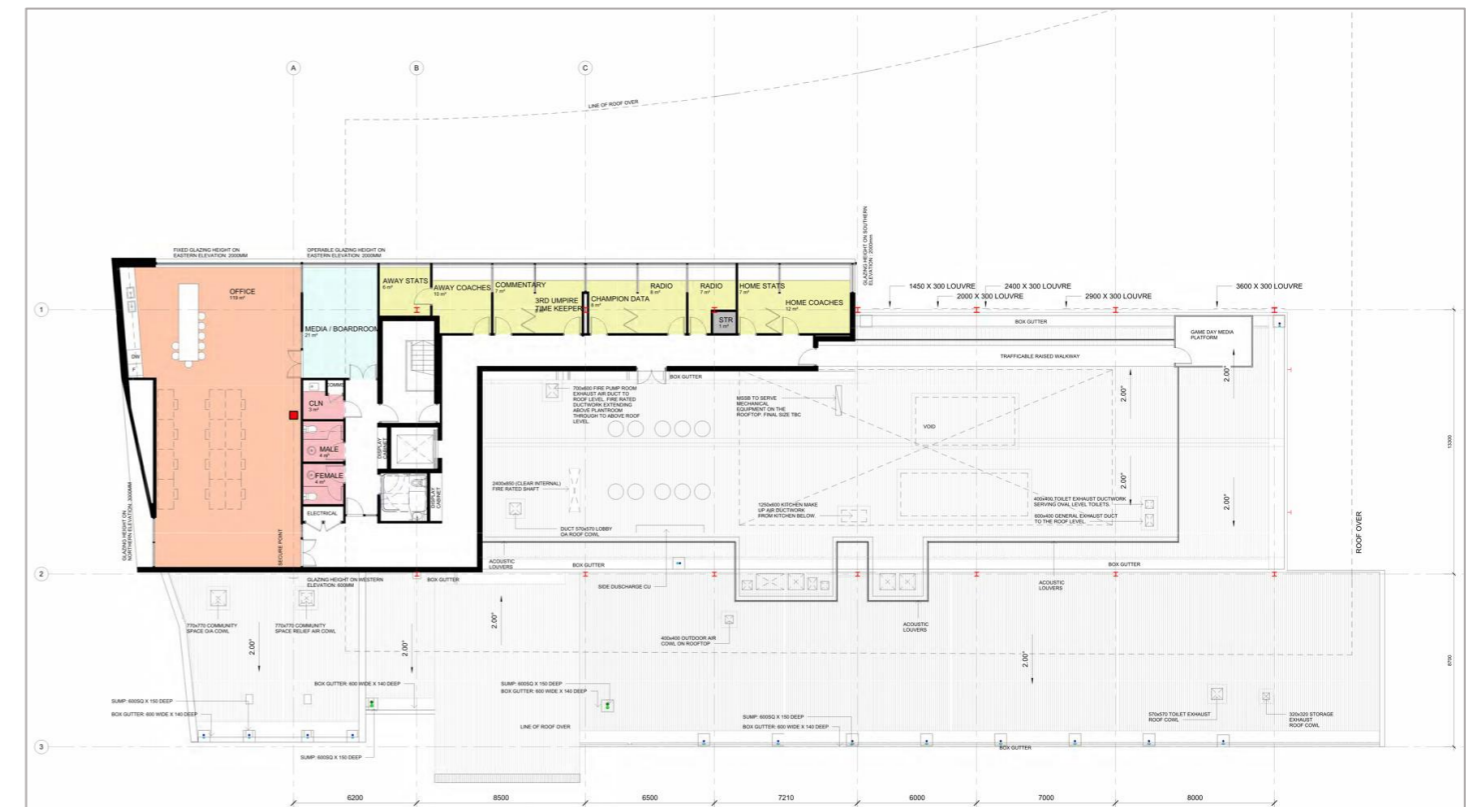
Lathlain Precinct Redevelopment Project – upper level floor plan (source: Hames Sharley, Rev L dated 14/06/23)
